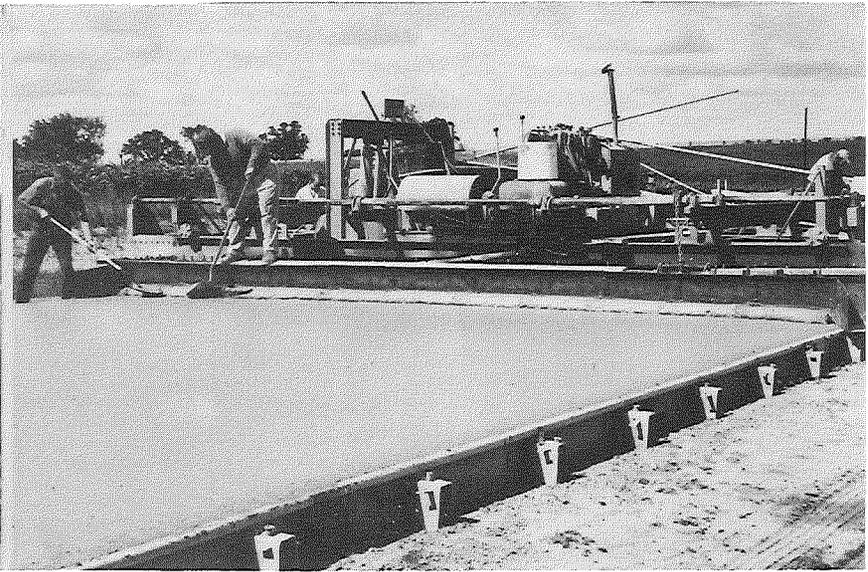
Final machine finishing with Heltzel Flexplane combination finisher-float machine.
